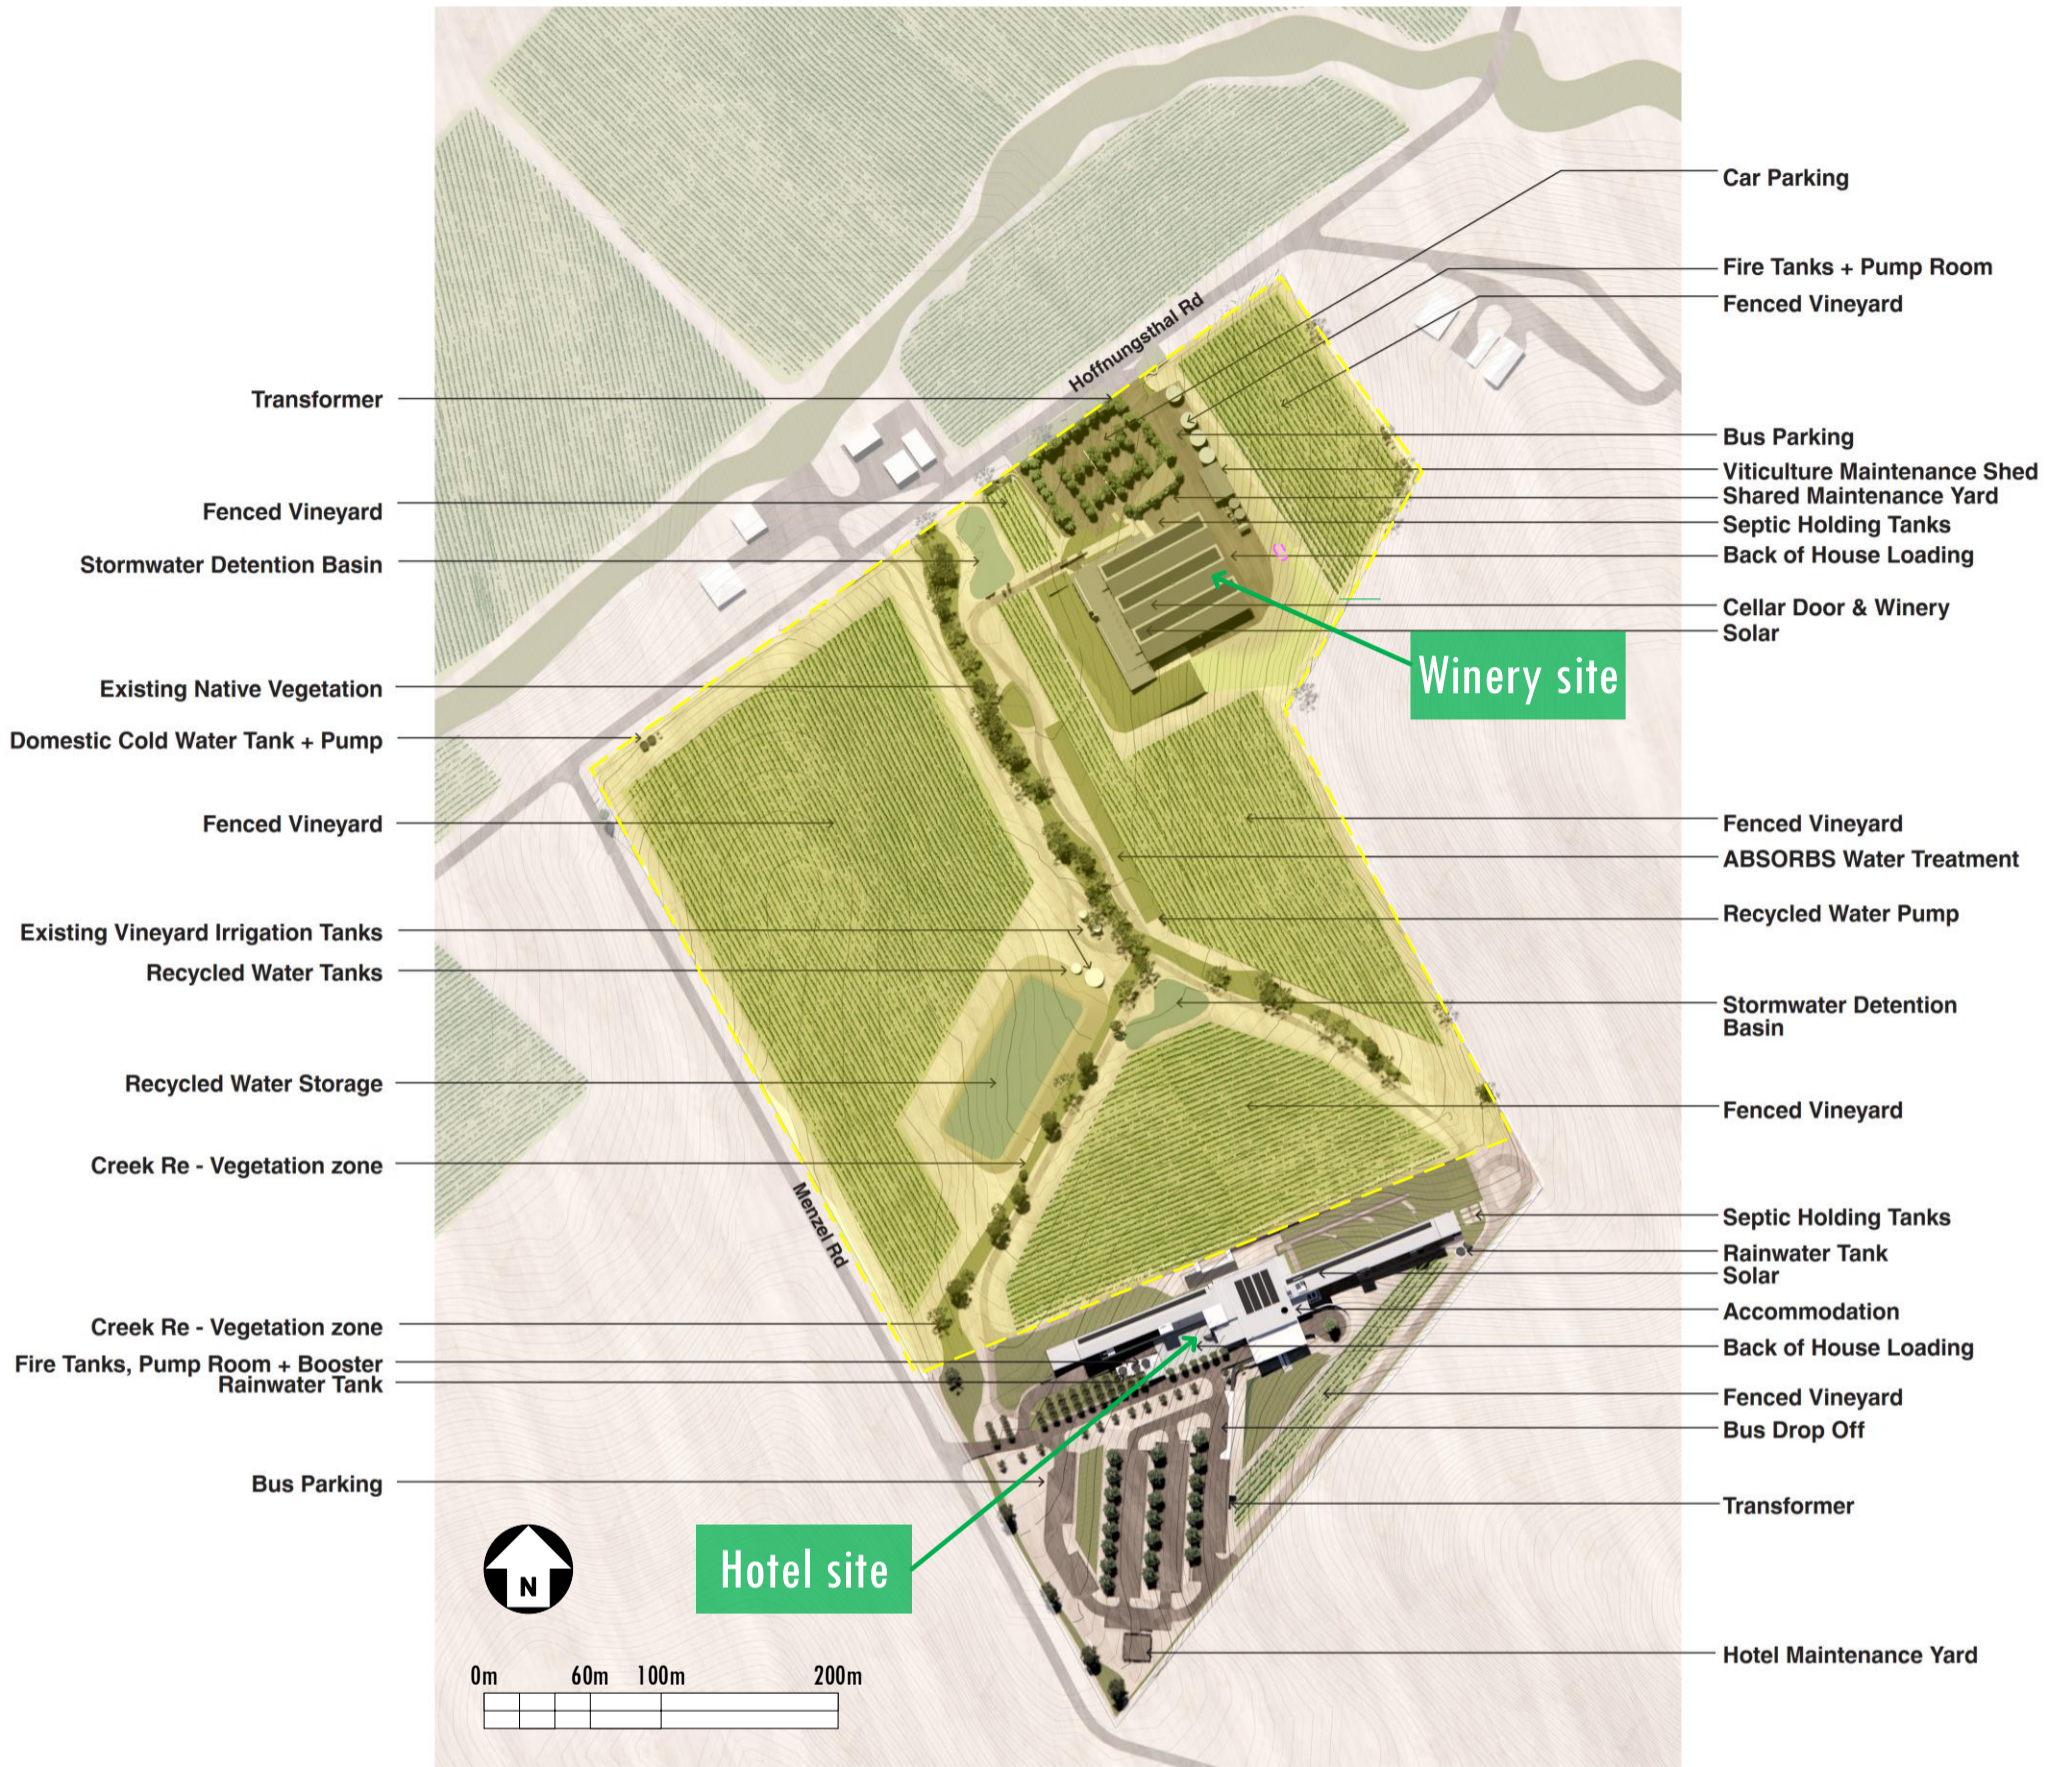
Development site showing winery and vineyard portion (highlighted in yellow). Site context plan reproduced from project concept plans (baukultur, 8 August 2025). The existing vineyard retained after completion of the Development could about 8 to 10 ha in size.
